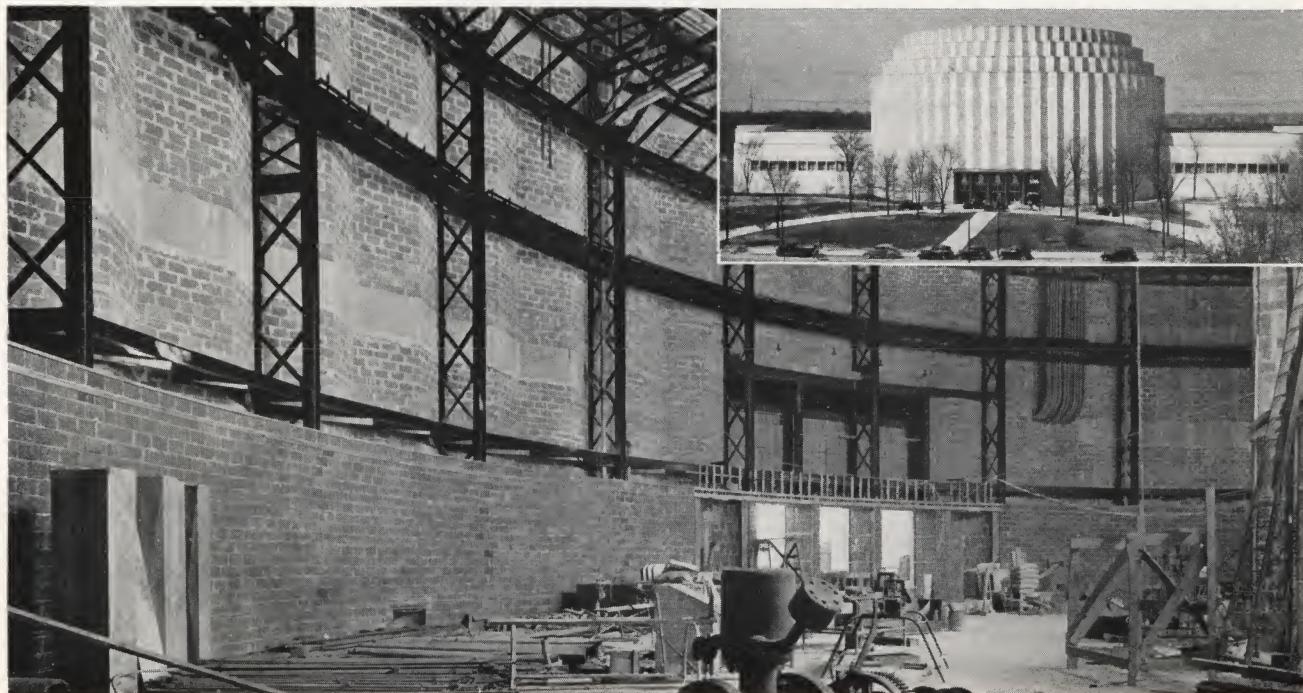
Ford Courtesy Building, Dearborn, Mich. After careful investigation of all materials, Ford engineers decided to use concrete masonry. Nearly 200,000 units went into the construction of this show place.
